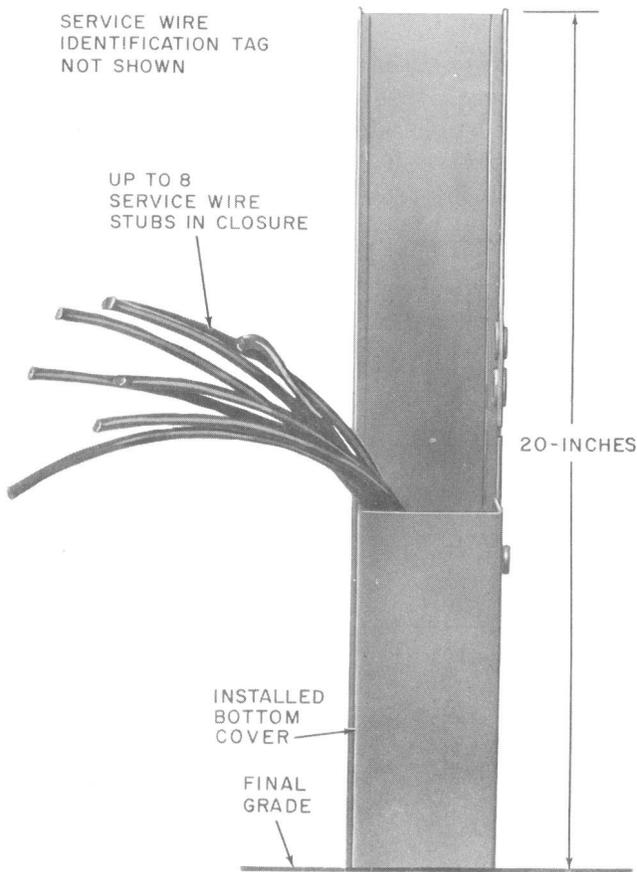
B Wire Storage Closure With Service Wire Stubs Installed
